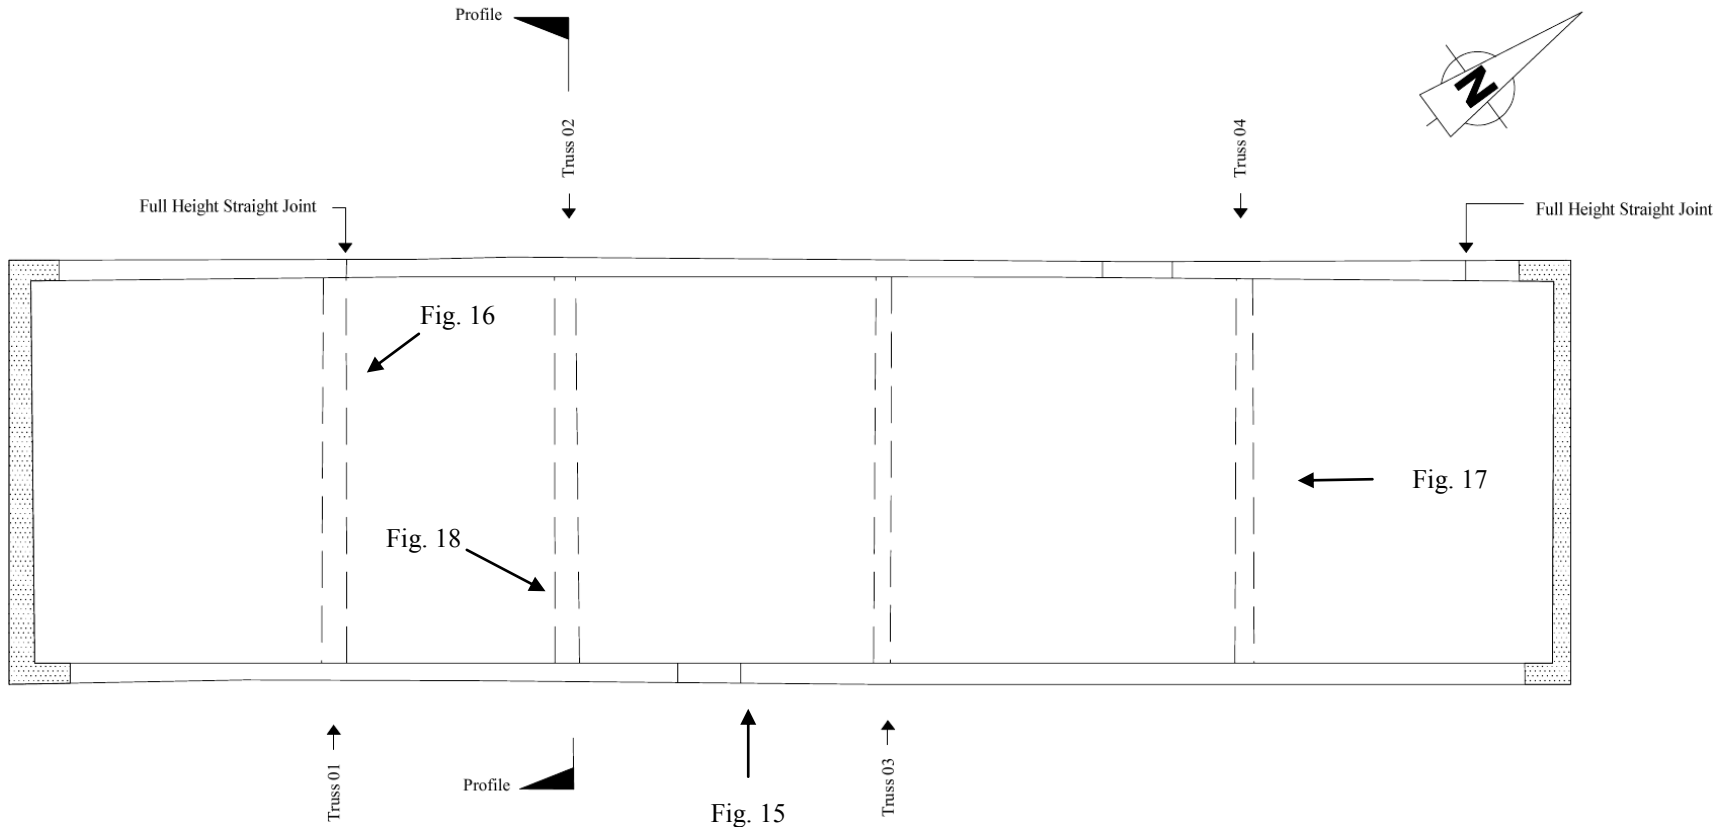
Sketch Plan of First Floor, Showing Locations of Trusses.
